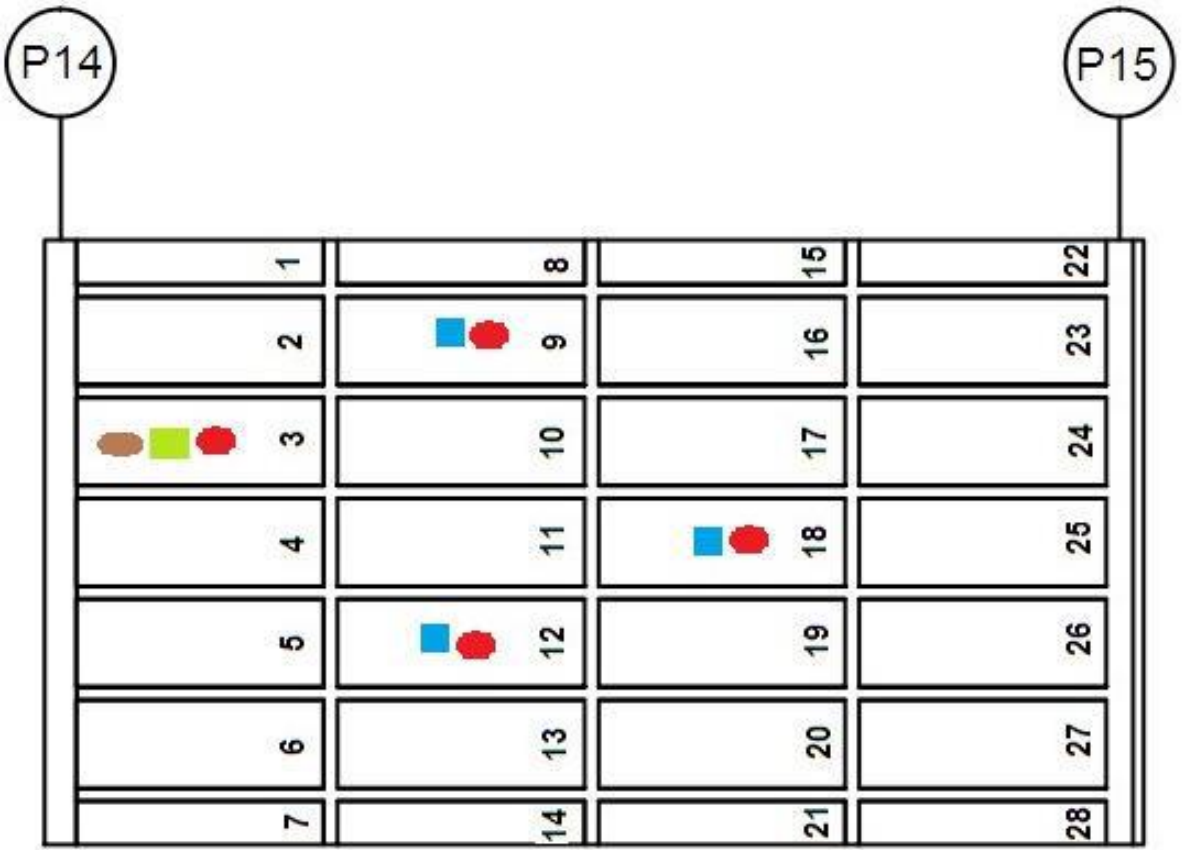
Test conducted at various locations between Pier P14 and Pier P15
